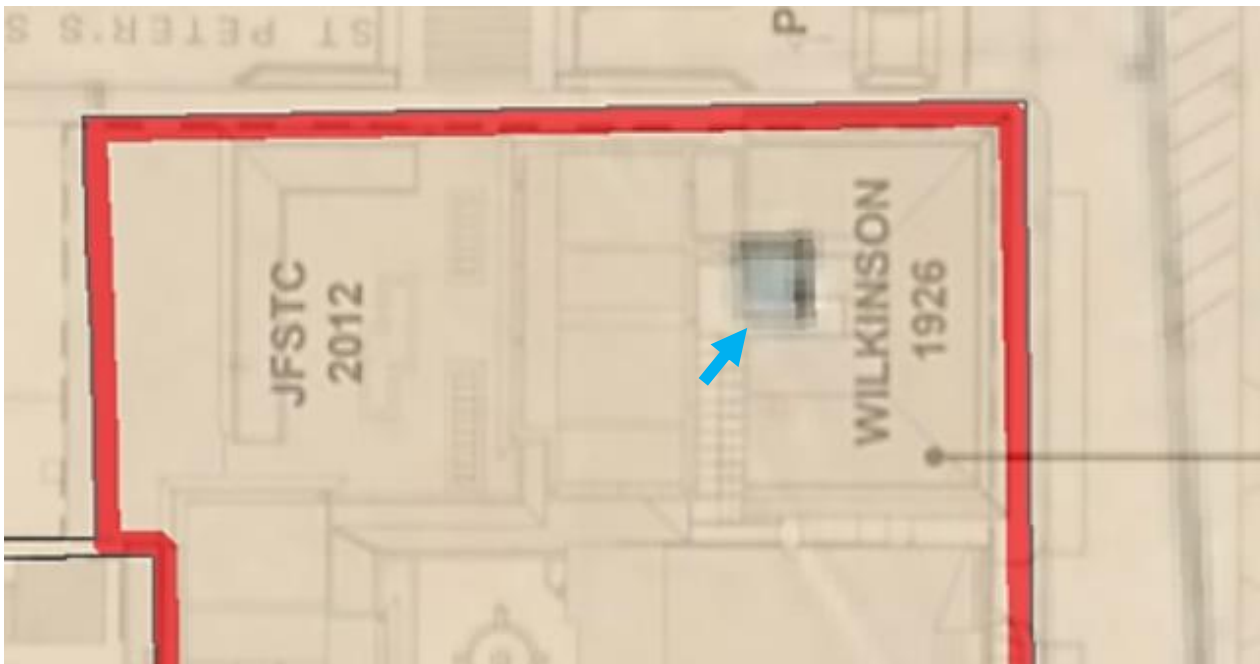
Overlay of 1835 map on SCEGGS existing site plan indicating location of stone cottage (indicated with arrow) within footprint of Wilkinson House
